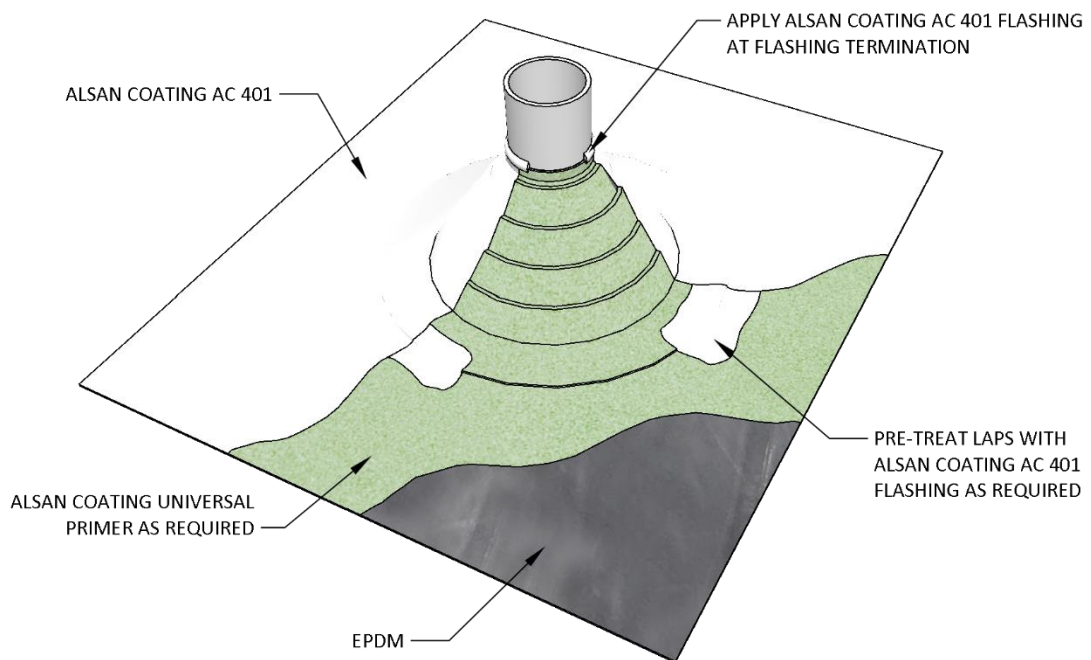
Acrylic Roof Coating Over EPDM, Penetration
